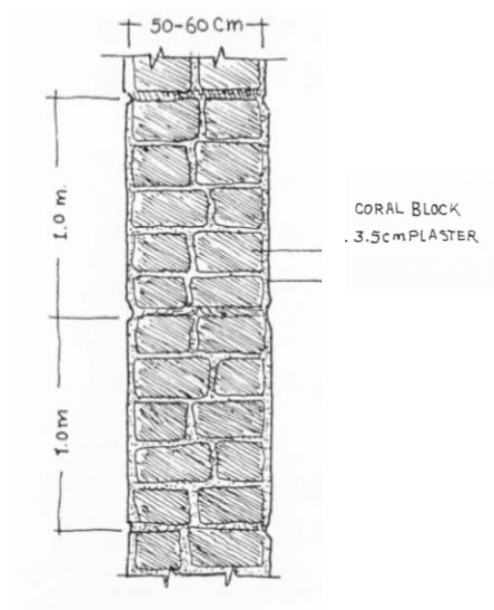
Typical section in the load bearing external wall of the traditional coral building (Al-Lyaly, 1990)
